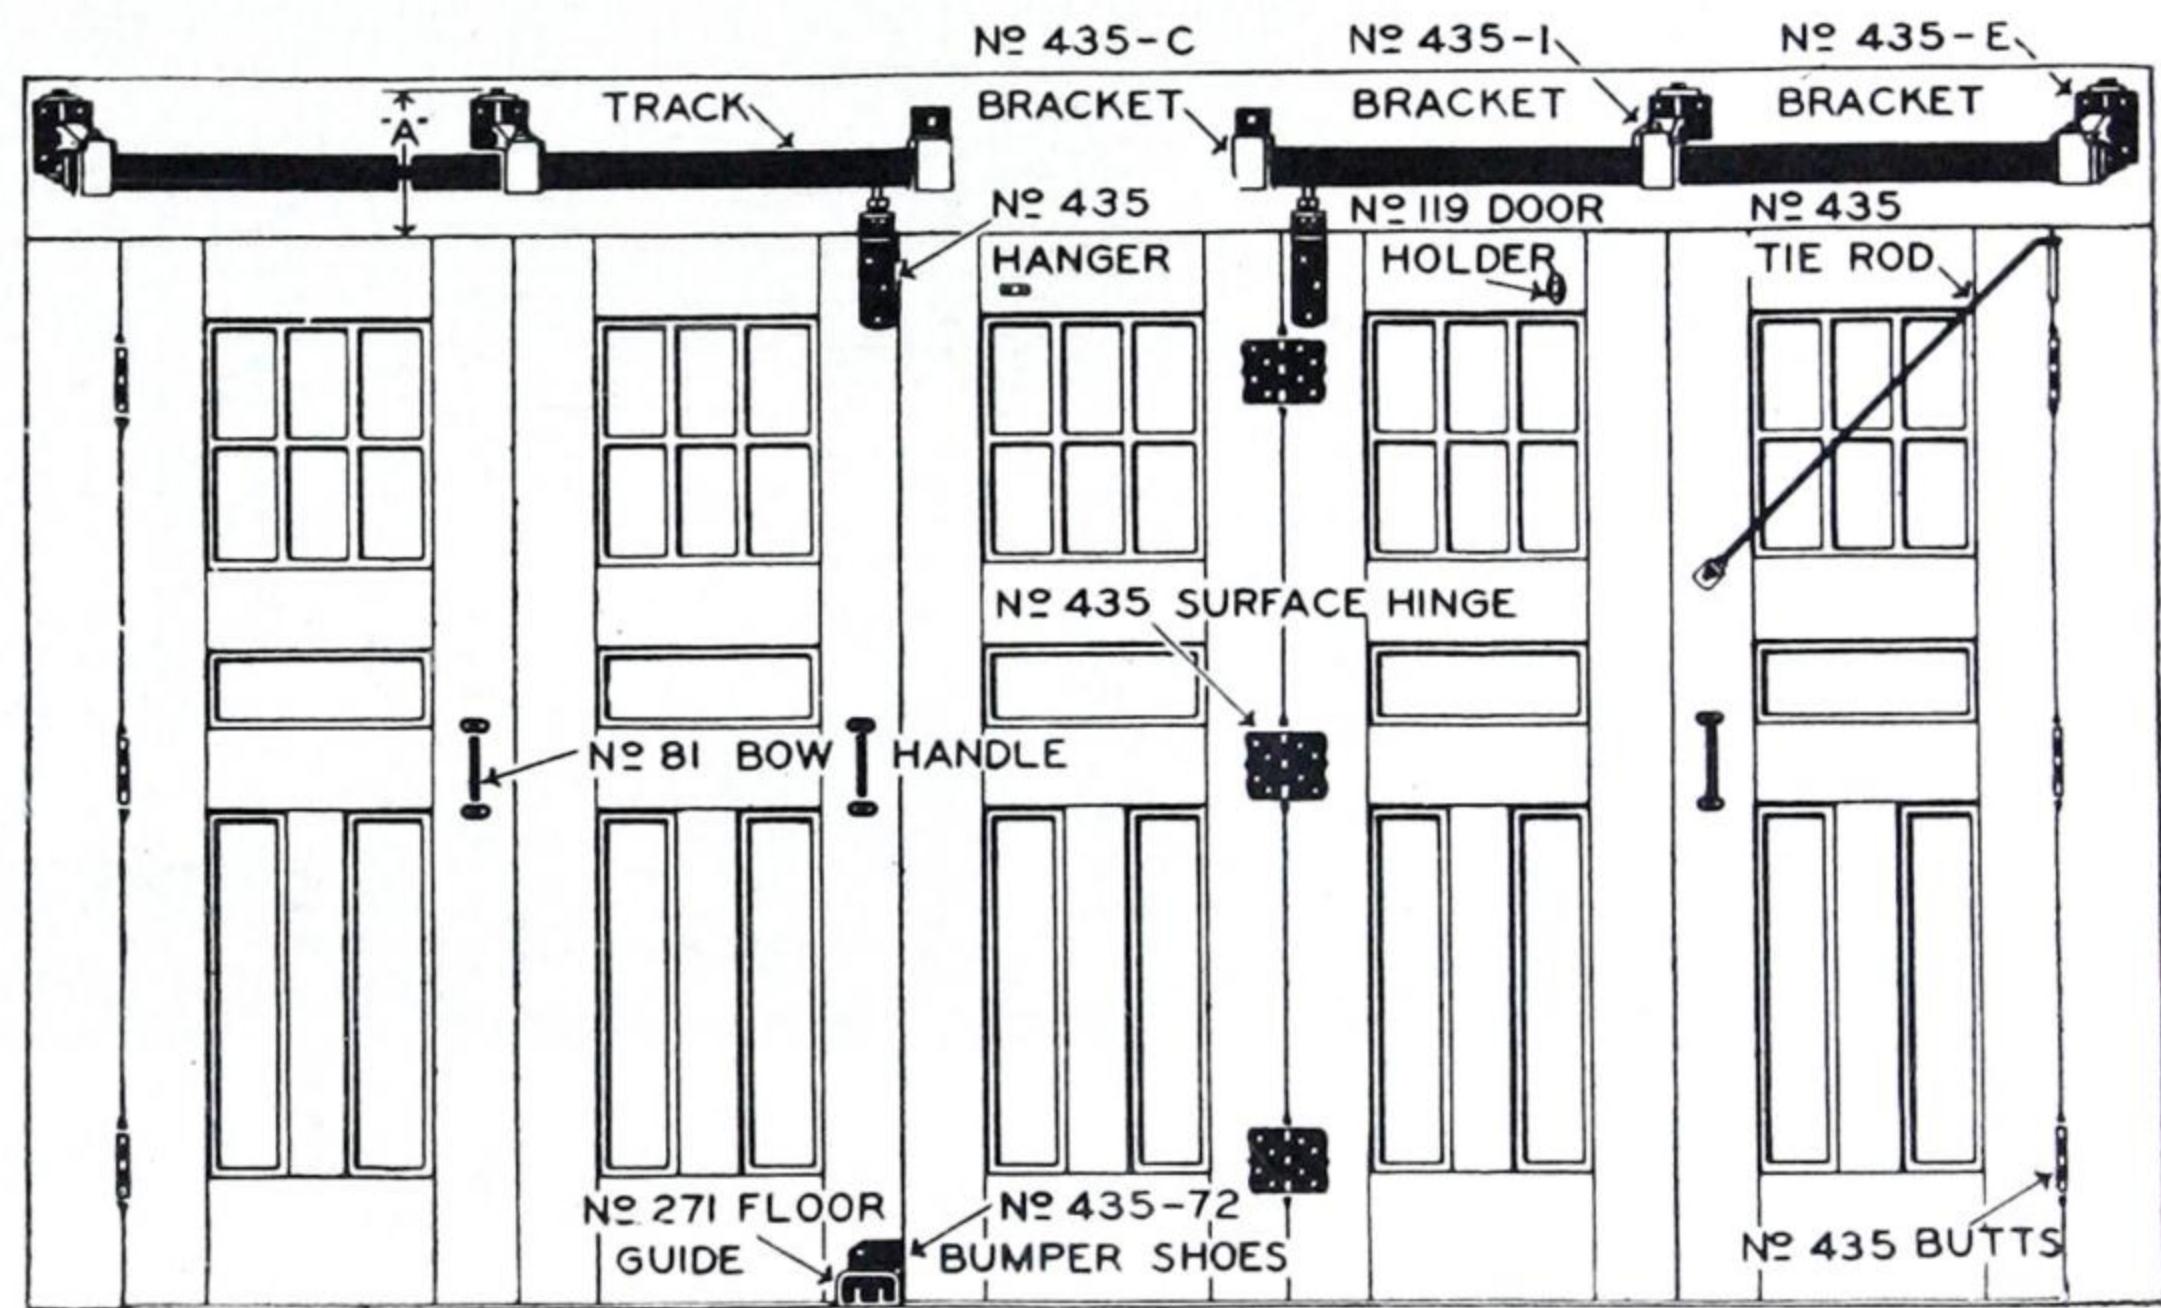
Exterior Elevation showing proper location and names of 435 Parts as used on the outside of a 5-Door Opening Out set.
